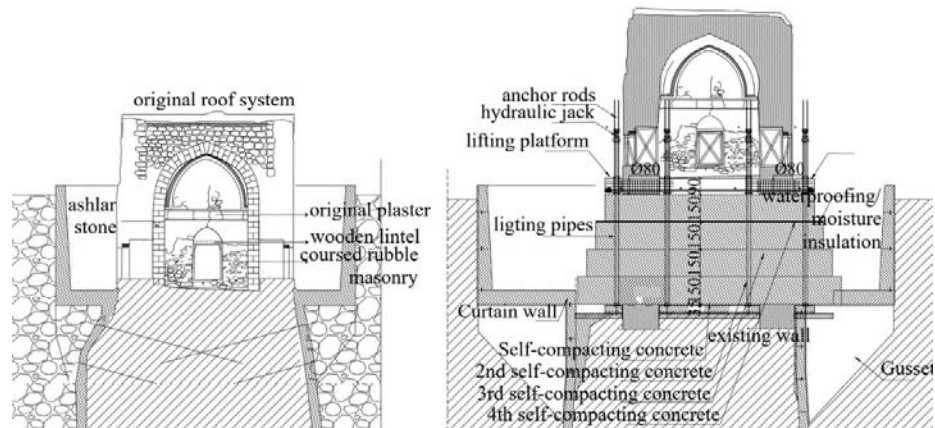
Figure A. Small Palace and in-situ elevation of the monument [4, 23]
